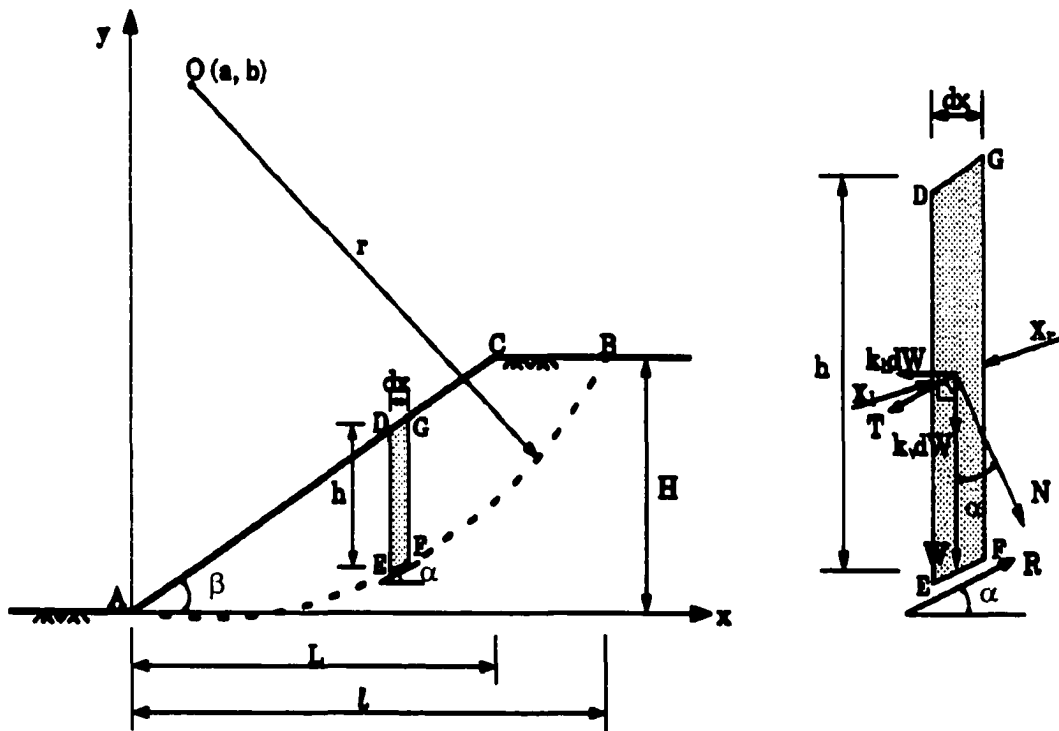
Typical Section for Toe Failure Slope (Cao and Zaman, 1999)
